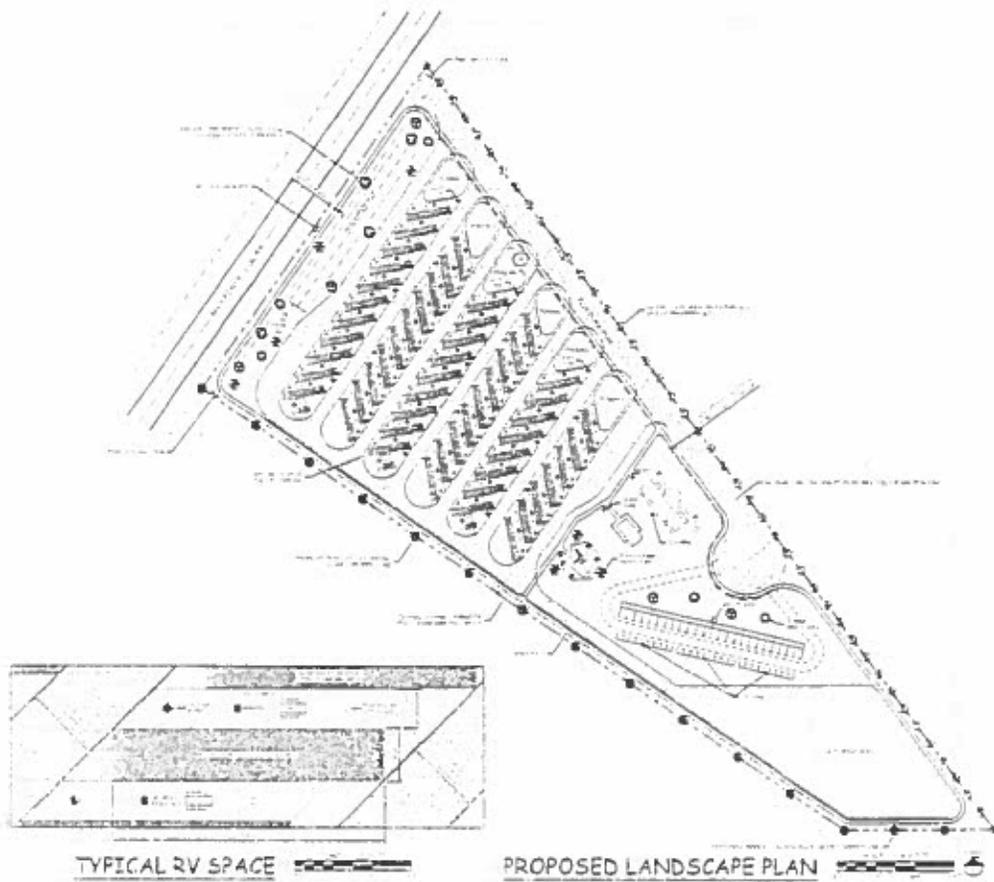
Entirety of proposed plan, including all 54 RV Spaces, dump station, bath/laundry house, and landscaping.
